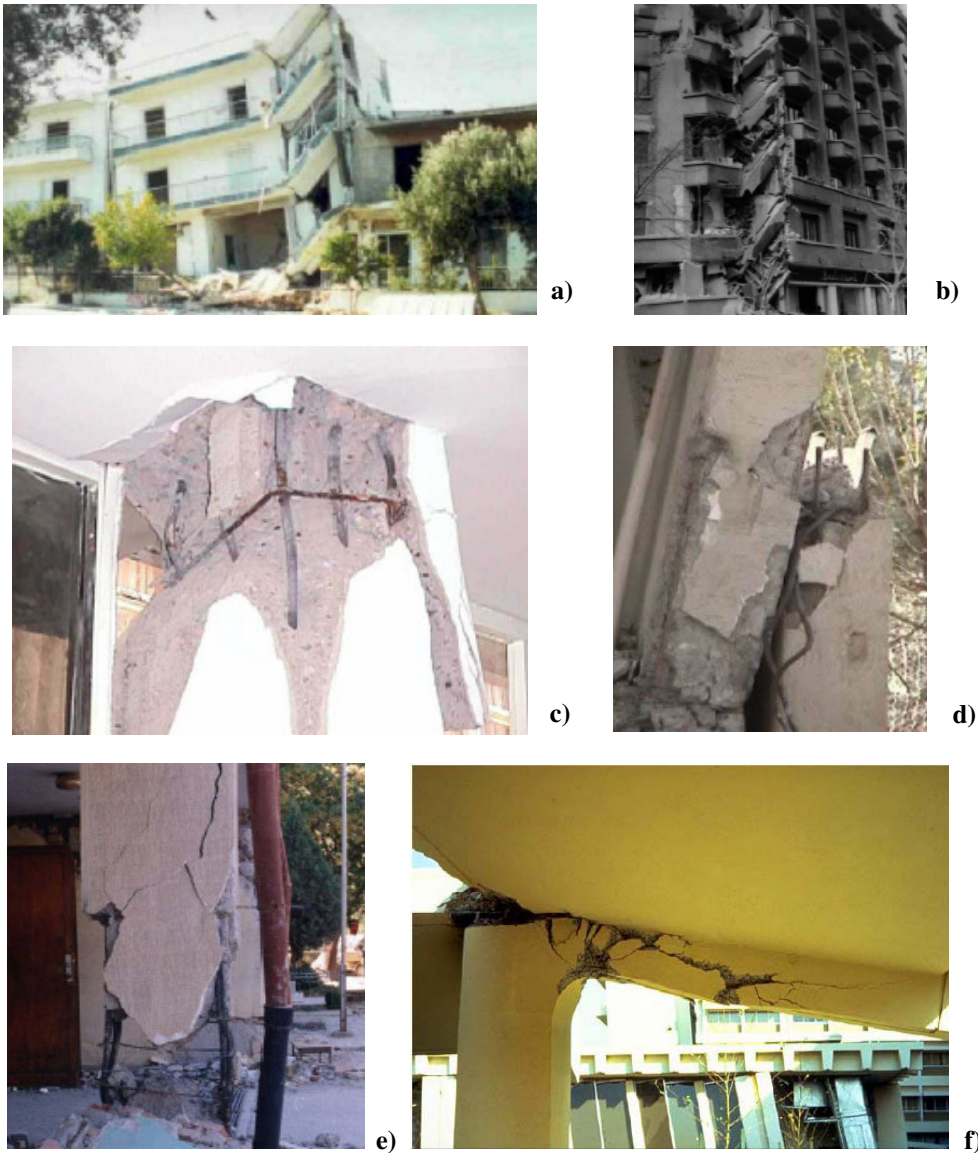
Damages in RC structures: soft-storey collapse (a); partial collapse due to soft-storey mechanism (b); column failure due to insufficient stirrups (c); column failure due to insufficient development length at the top (d); insufficient detailing at the joint (e); beam failure due to lack of steel bars (f); connection failure due to insufficient detailing near connection zone (g, h); failure of beam-to-column connections (i, l) and shear cracking in concrete shear walls (m, n) (continues)
